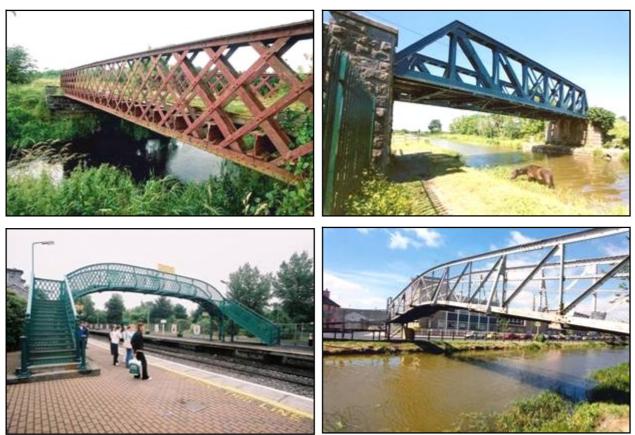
(*top left*): Lattice girder bridge, Glasderry More Td (042-003). Fig 2.13b (*top right*): Metal Bridge, Tullamore (017-002). Fig 2.13c (*bottom left*): Lattice girder footbridge, Tullamore Station (017-004). Fig 2.13d (*bottom right*): Warren truss footbridge of 1934 over Grand Canal, Tullamore (017-093).
